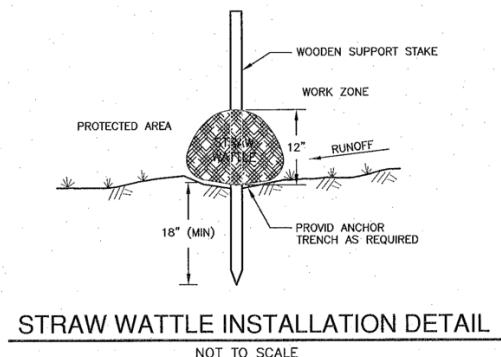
Site plan detail of wattle installation from Superseding Order of Conditions (DEP File #338-0706).
